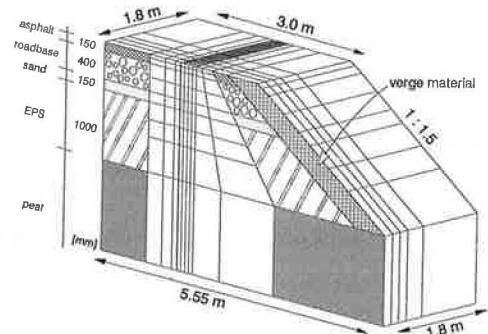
Pavement materials and corresponding layer thickness values in the CAPA-3D pavement structure model with a single vertical interface layer.
